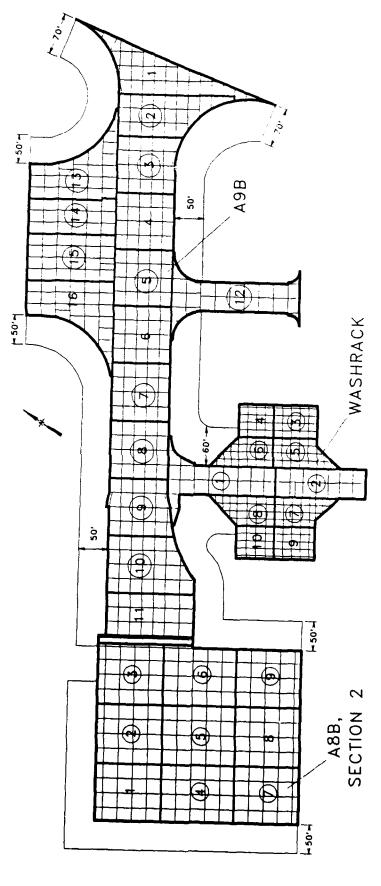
Sample unit layout, Ramp 4 (feature A8B, section 1)
